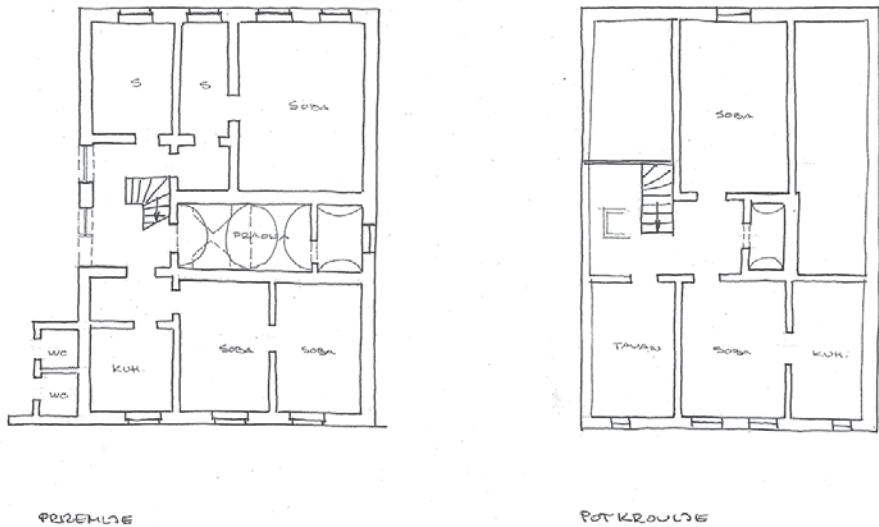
Matoševa 7, Mayer House, ground floor and attic plan (MK-UZKB-KOZ)
